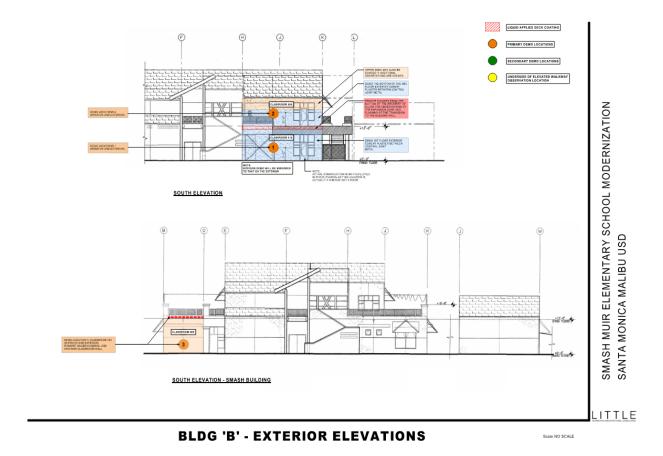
Demo Locations, Bldg B_Exterior Elevations_Demo Locations.
